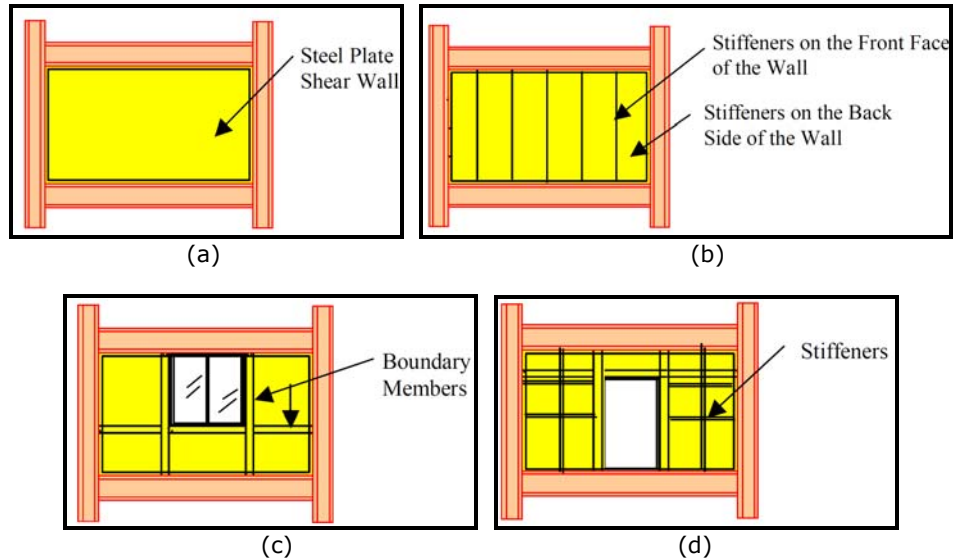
Stiffened and Unstiffened Steel Shear Walls: a) Steel Plate Shear Wall (unstiffened); b) Steel Plate Shear Wall (stiffened); c) Stiffened Steel Shear Wall with Opening; d) Stiffened Steel Shear Wall with Opening
